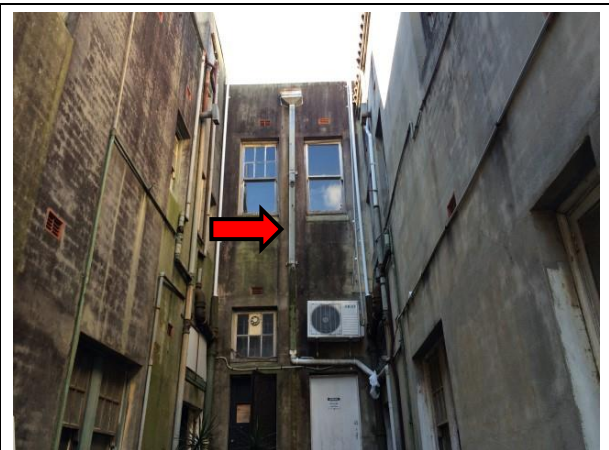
Stormwater drainage down pipes at 94 Carrington Road
